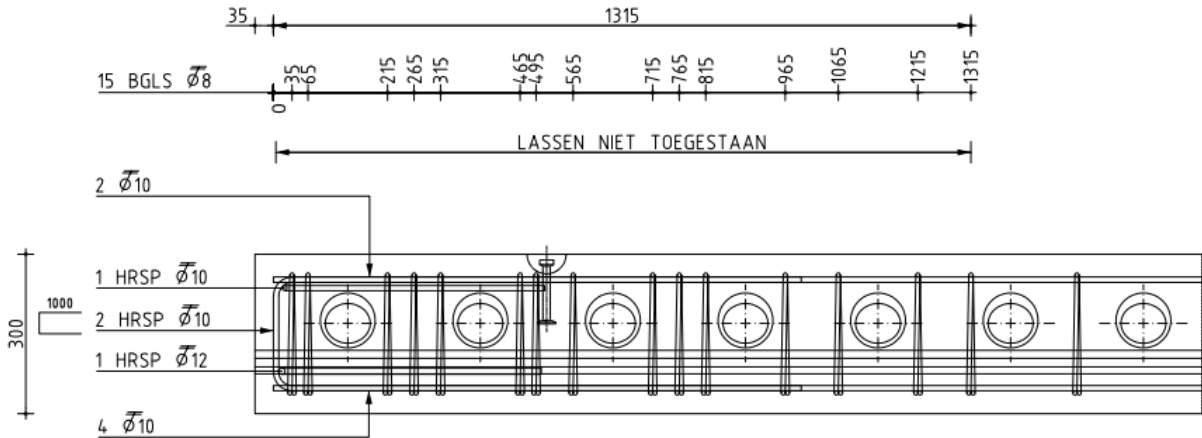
Shear reinforcement layout at prestressed girder ends
